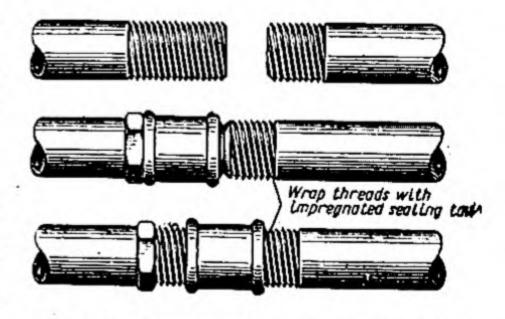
Running thread and coupling jointing of steel pipes in air-tight installations.
